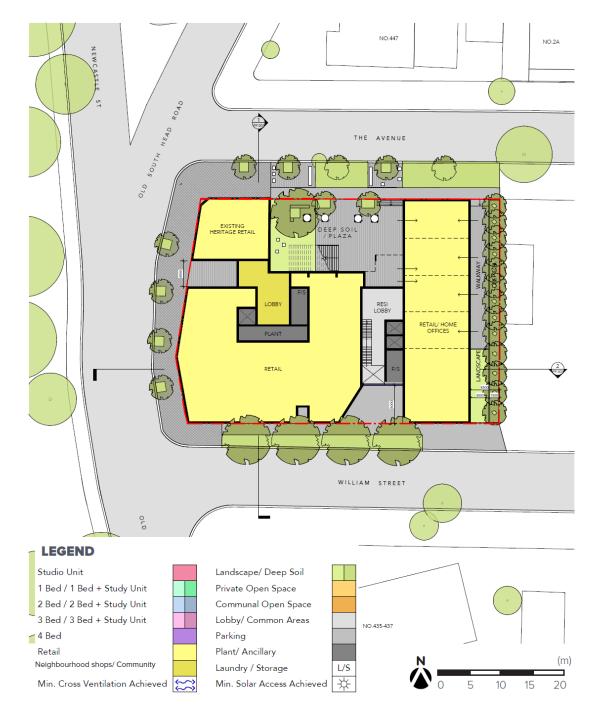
Ground floor plan of the concept scheme illustrating the location and configuration of the public plaza (Source: Place Design Justification Report)
